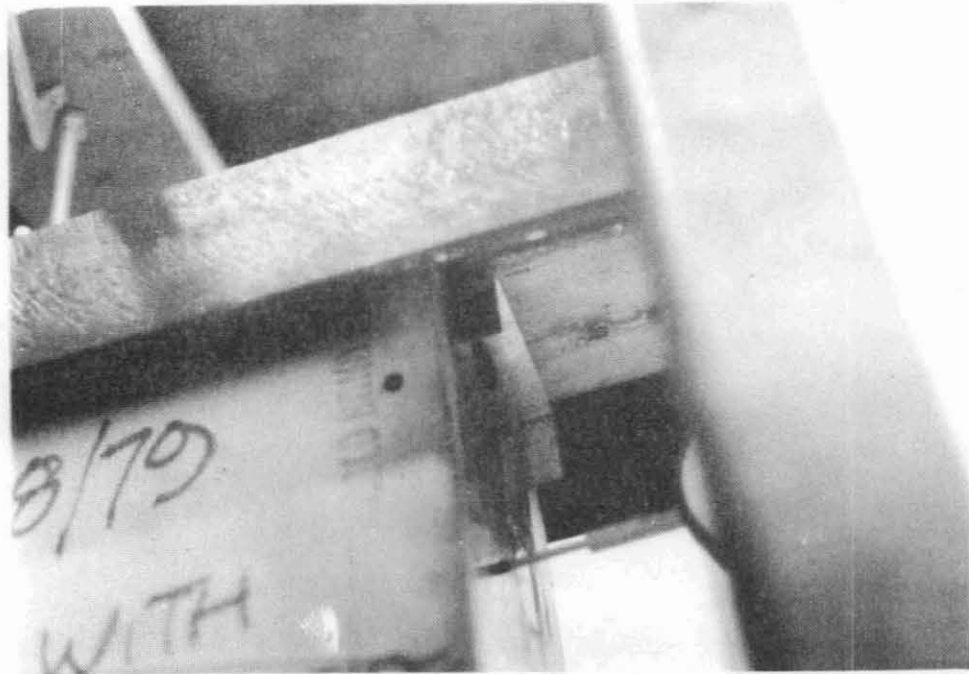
Partition Test Specimen P3: Typical Failure @ Top Runner
